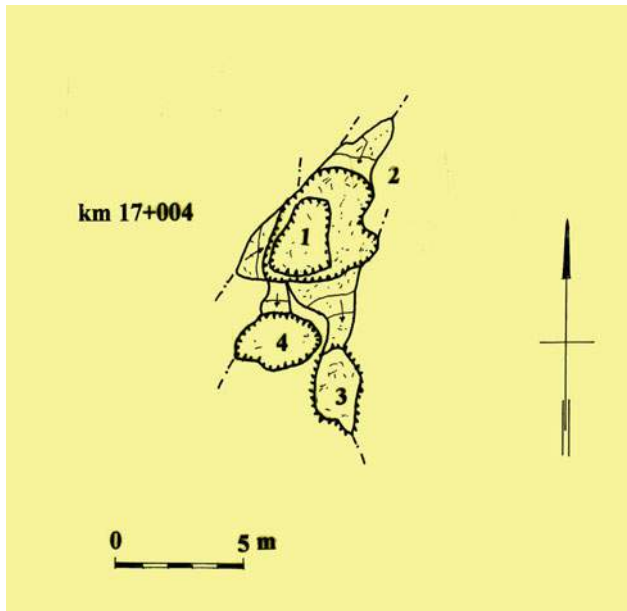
Plan of cavern at km 17 + 004 on Bosiljevo—Josipdol section
